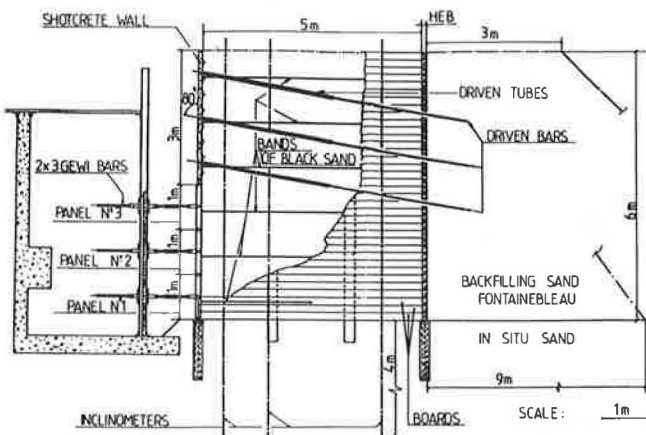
Layout of Wall 2 at end of Phase 3.
